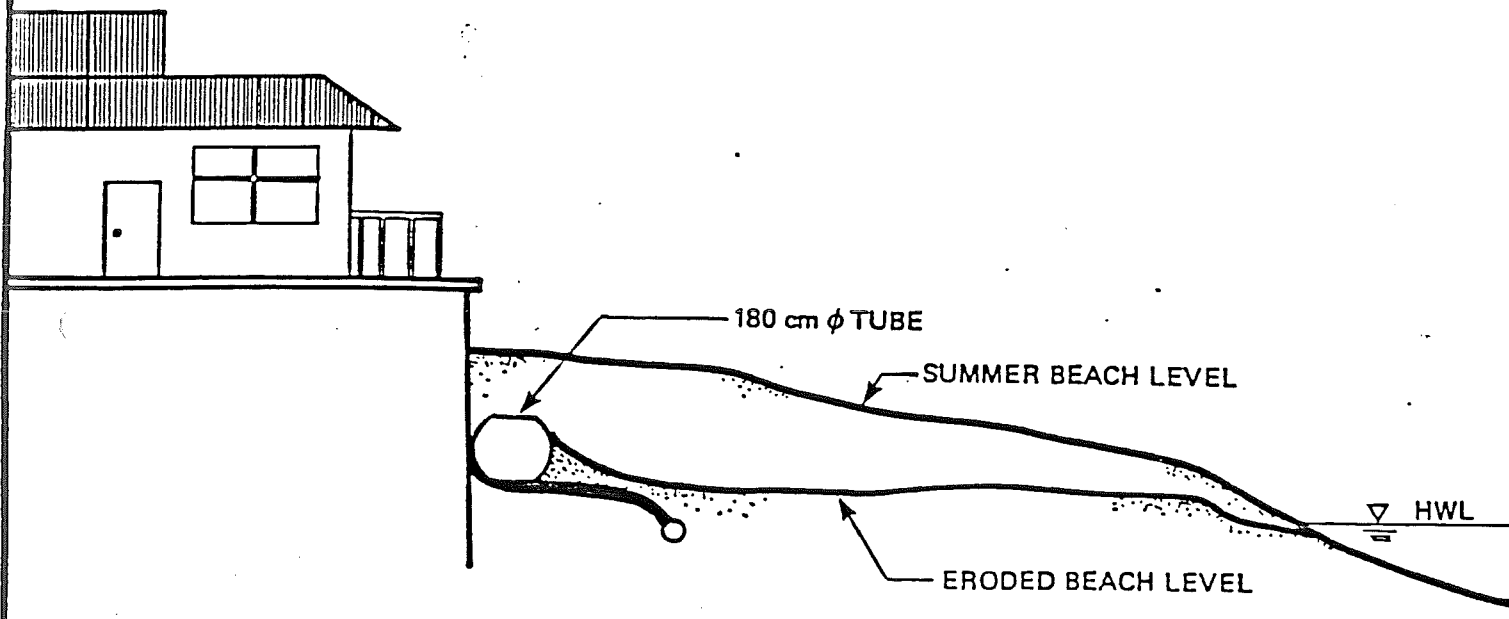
SEAWALL AND BULKHEAD SECTION
